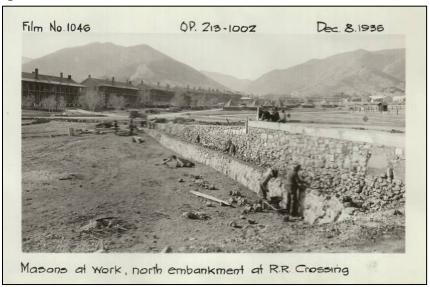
Southern Pacific Railroad embankment under construction, 1936.
